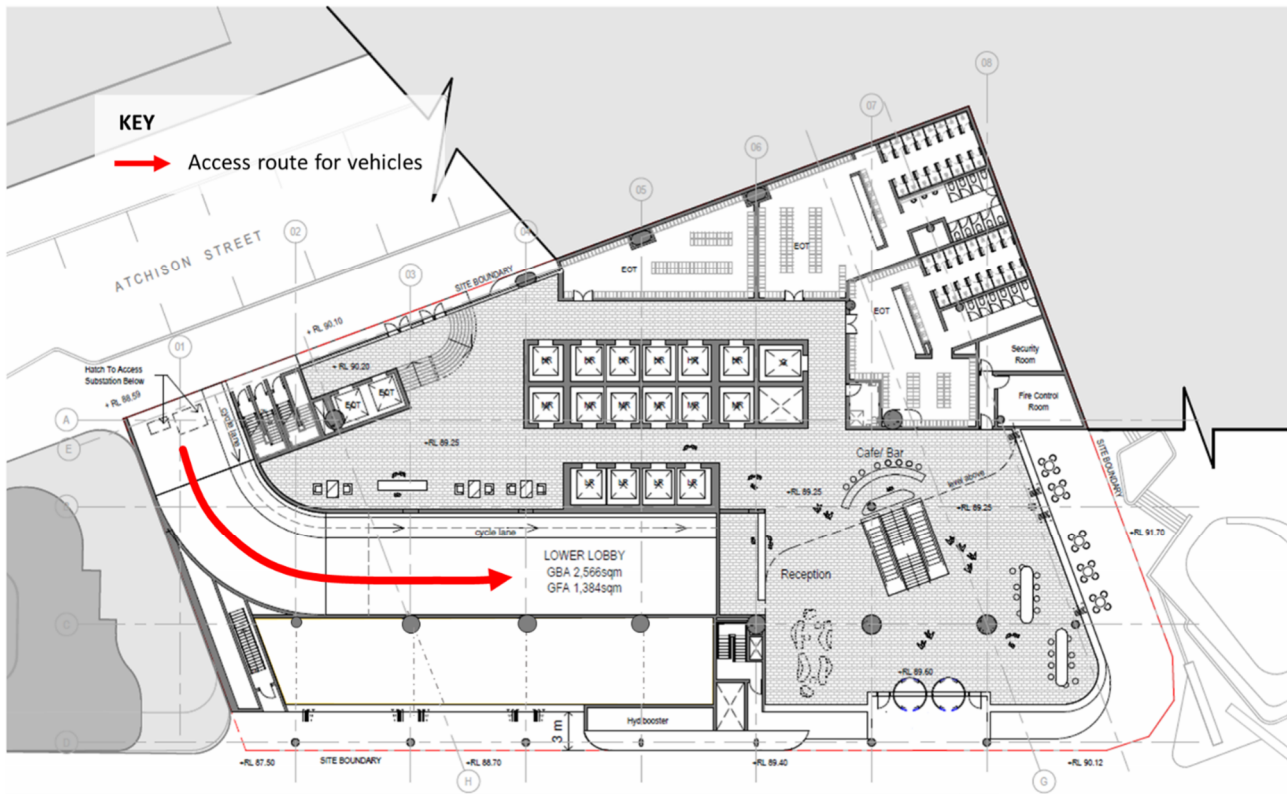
Indicative location of end of trip facilities on the Ground Floor
